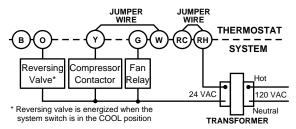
Typical wiring diagram for heat pump with cool active reversing valve
